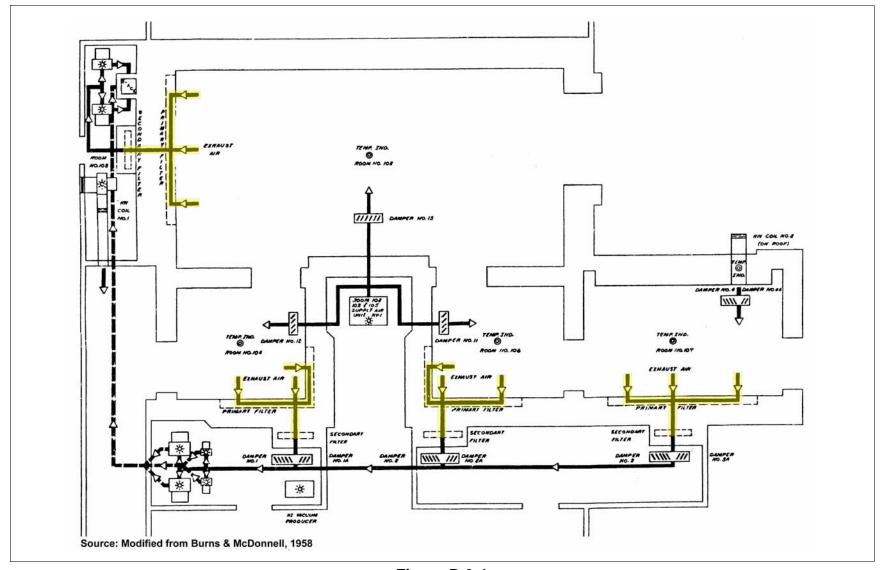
CAU 117, Building 2201 Schematic of HEPA Ventilation System
